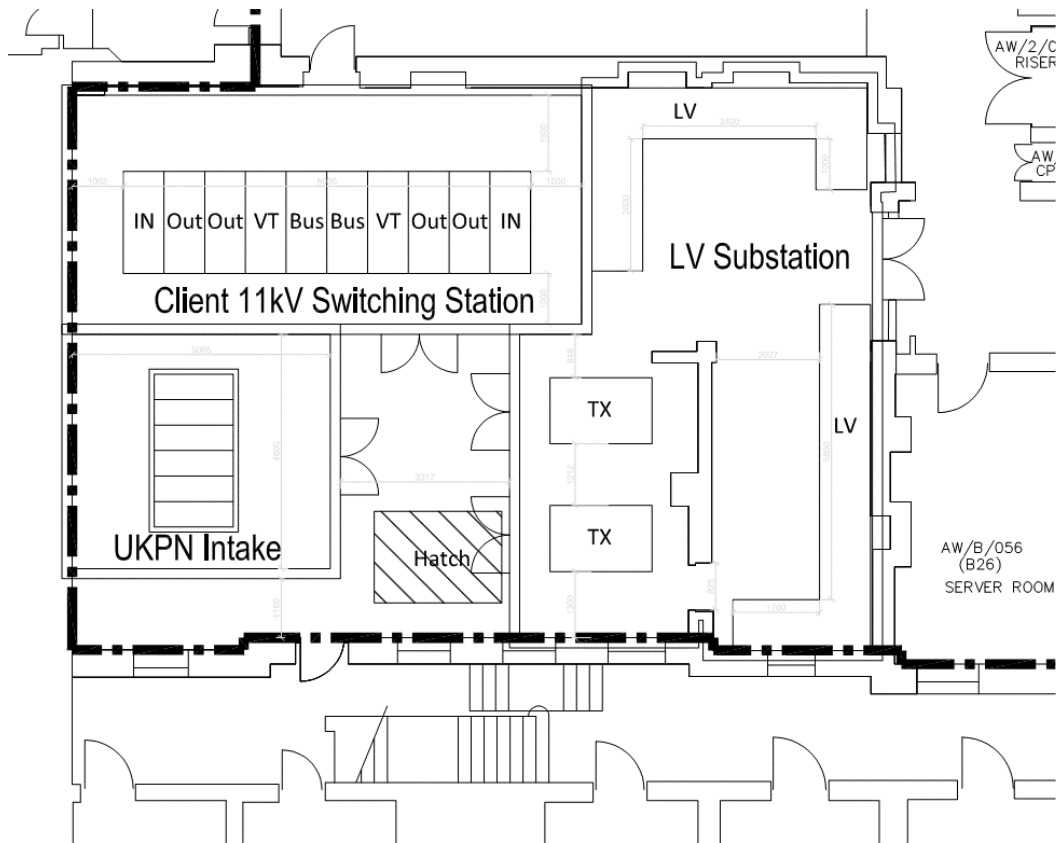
Proposed location for UKPN intake room and Client Owned 11kV Switching Station
